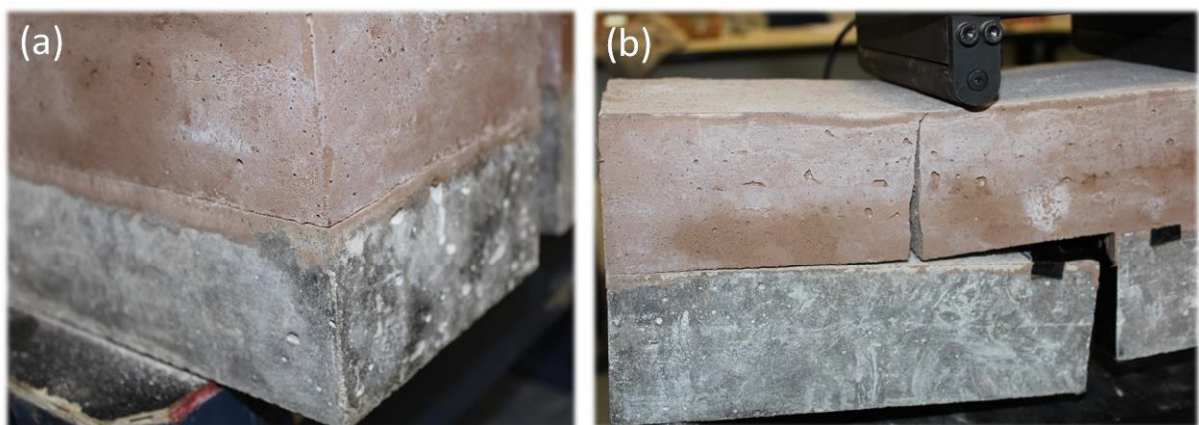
Delamination problem: (a) fissured interface before test and (b) failure beam with high delamination on the interface
